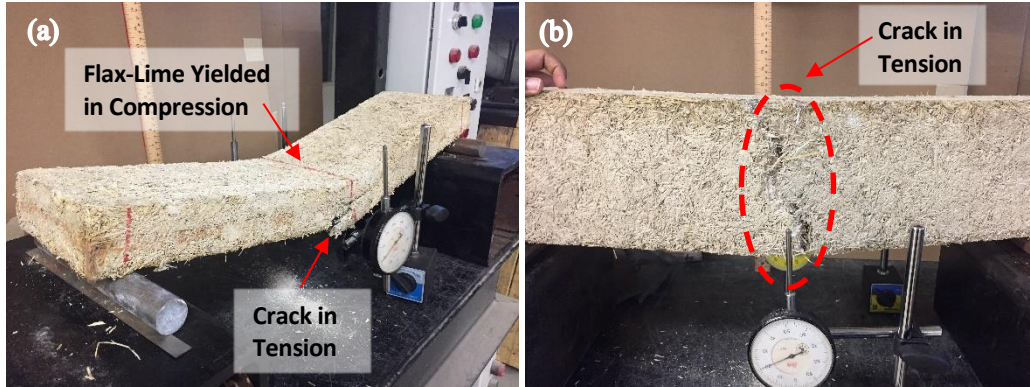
Typical bending failure mode: (a) side view; (b) bottom view.
